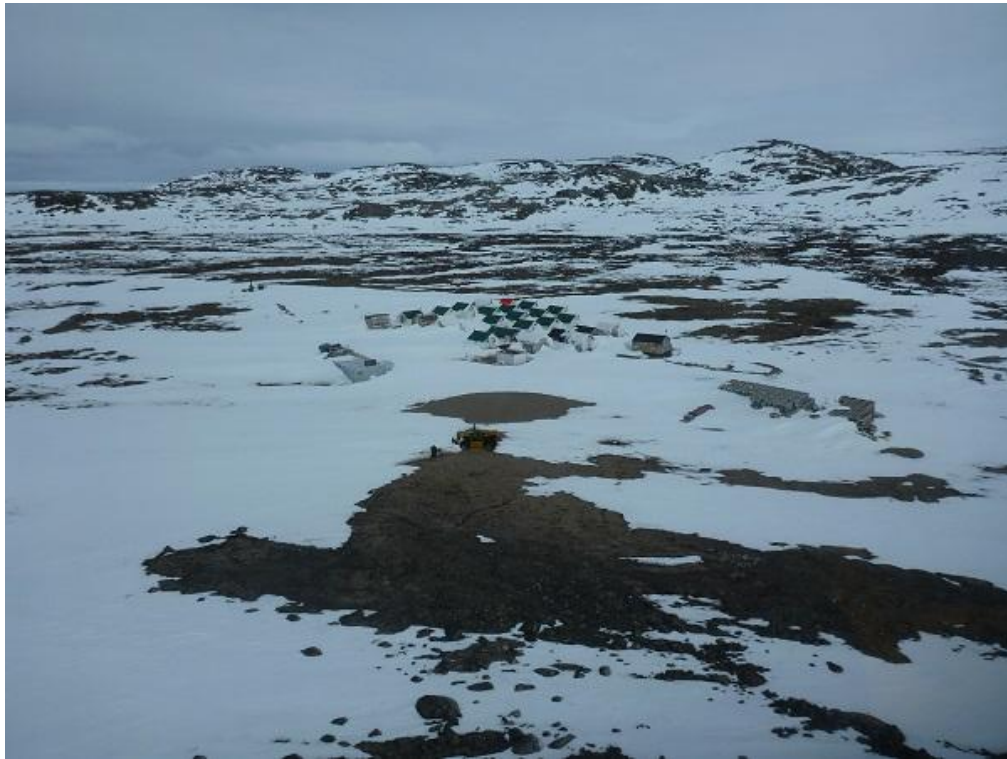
Construction of Milne Port Camp Pad Diversion Ditch – October 2017
